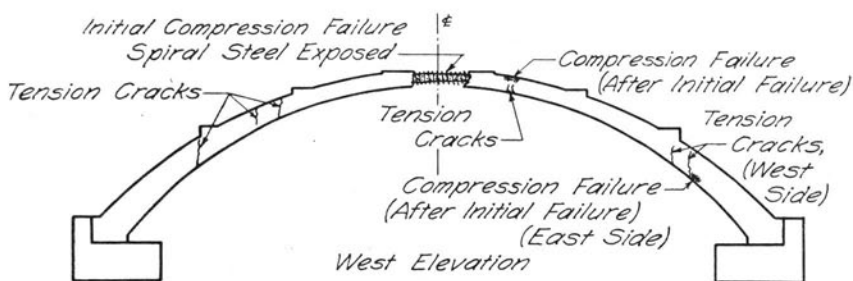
FAILURE OF ARCH 26-6 AT CROWN
